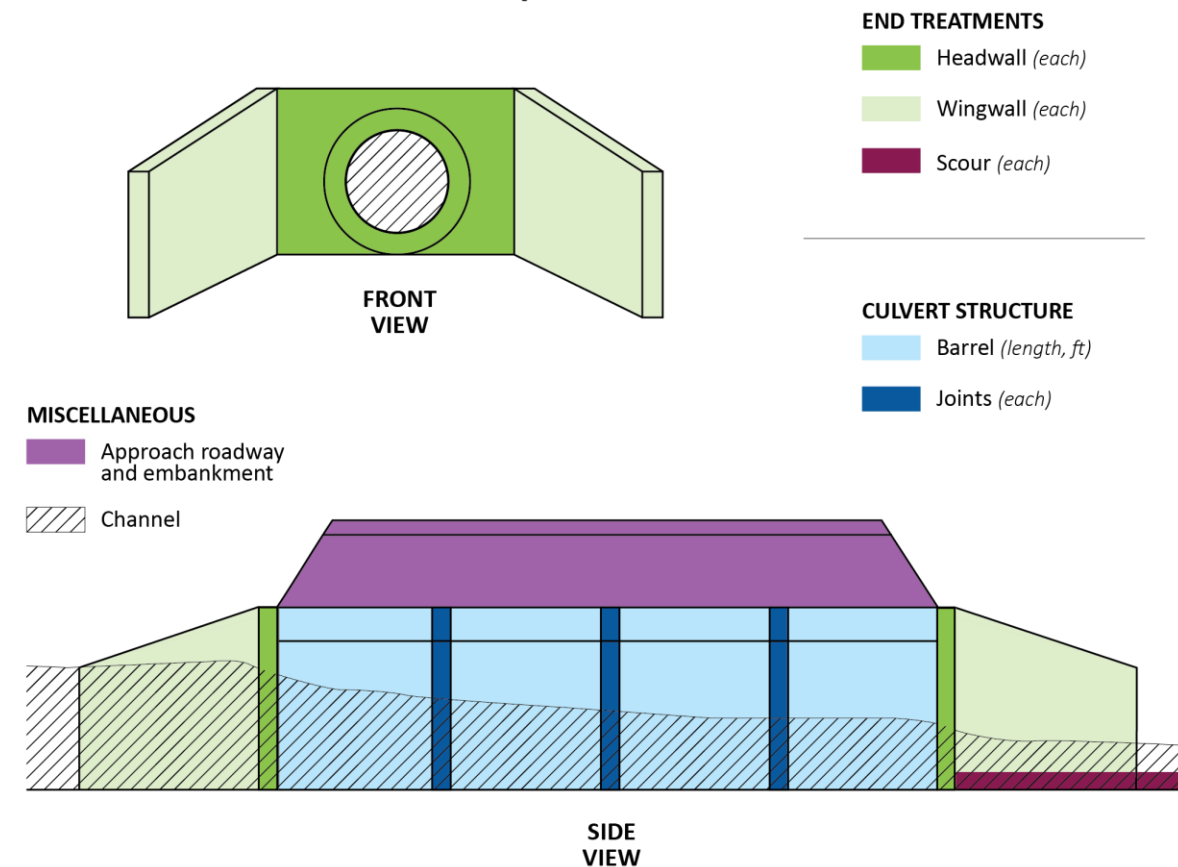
Elements and components for Culverts Less Than 10-Foot Span
